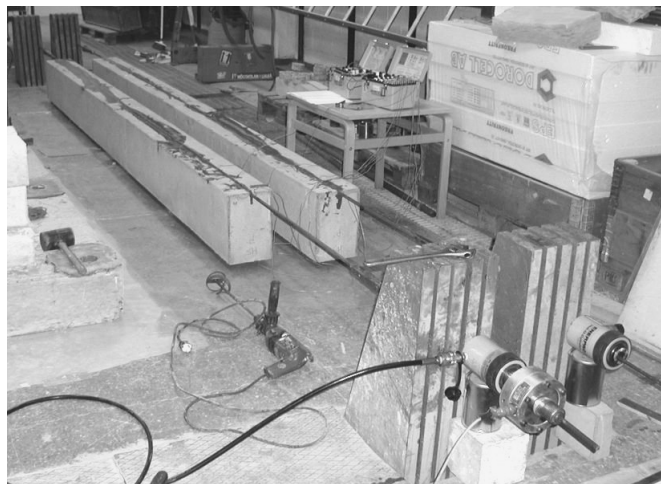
Laboratory test on a reinforced concrete beam strengthened with prestressed NSM CFRP-rods (Nordin, 2005).
